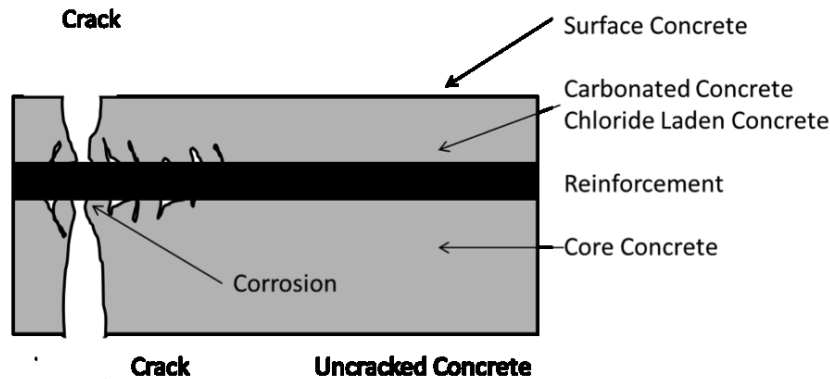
An illustration of a through crack in a reinforced concrete element (after Bernard and Brühwiler 2003).
